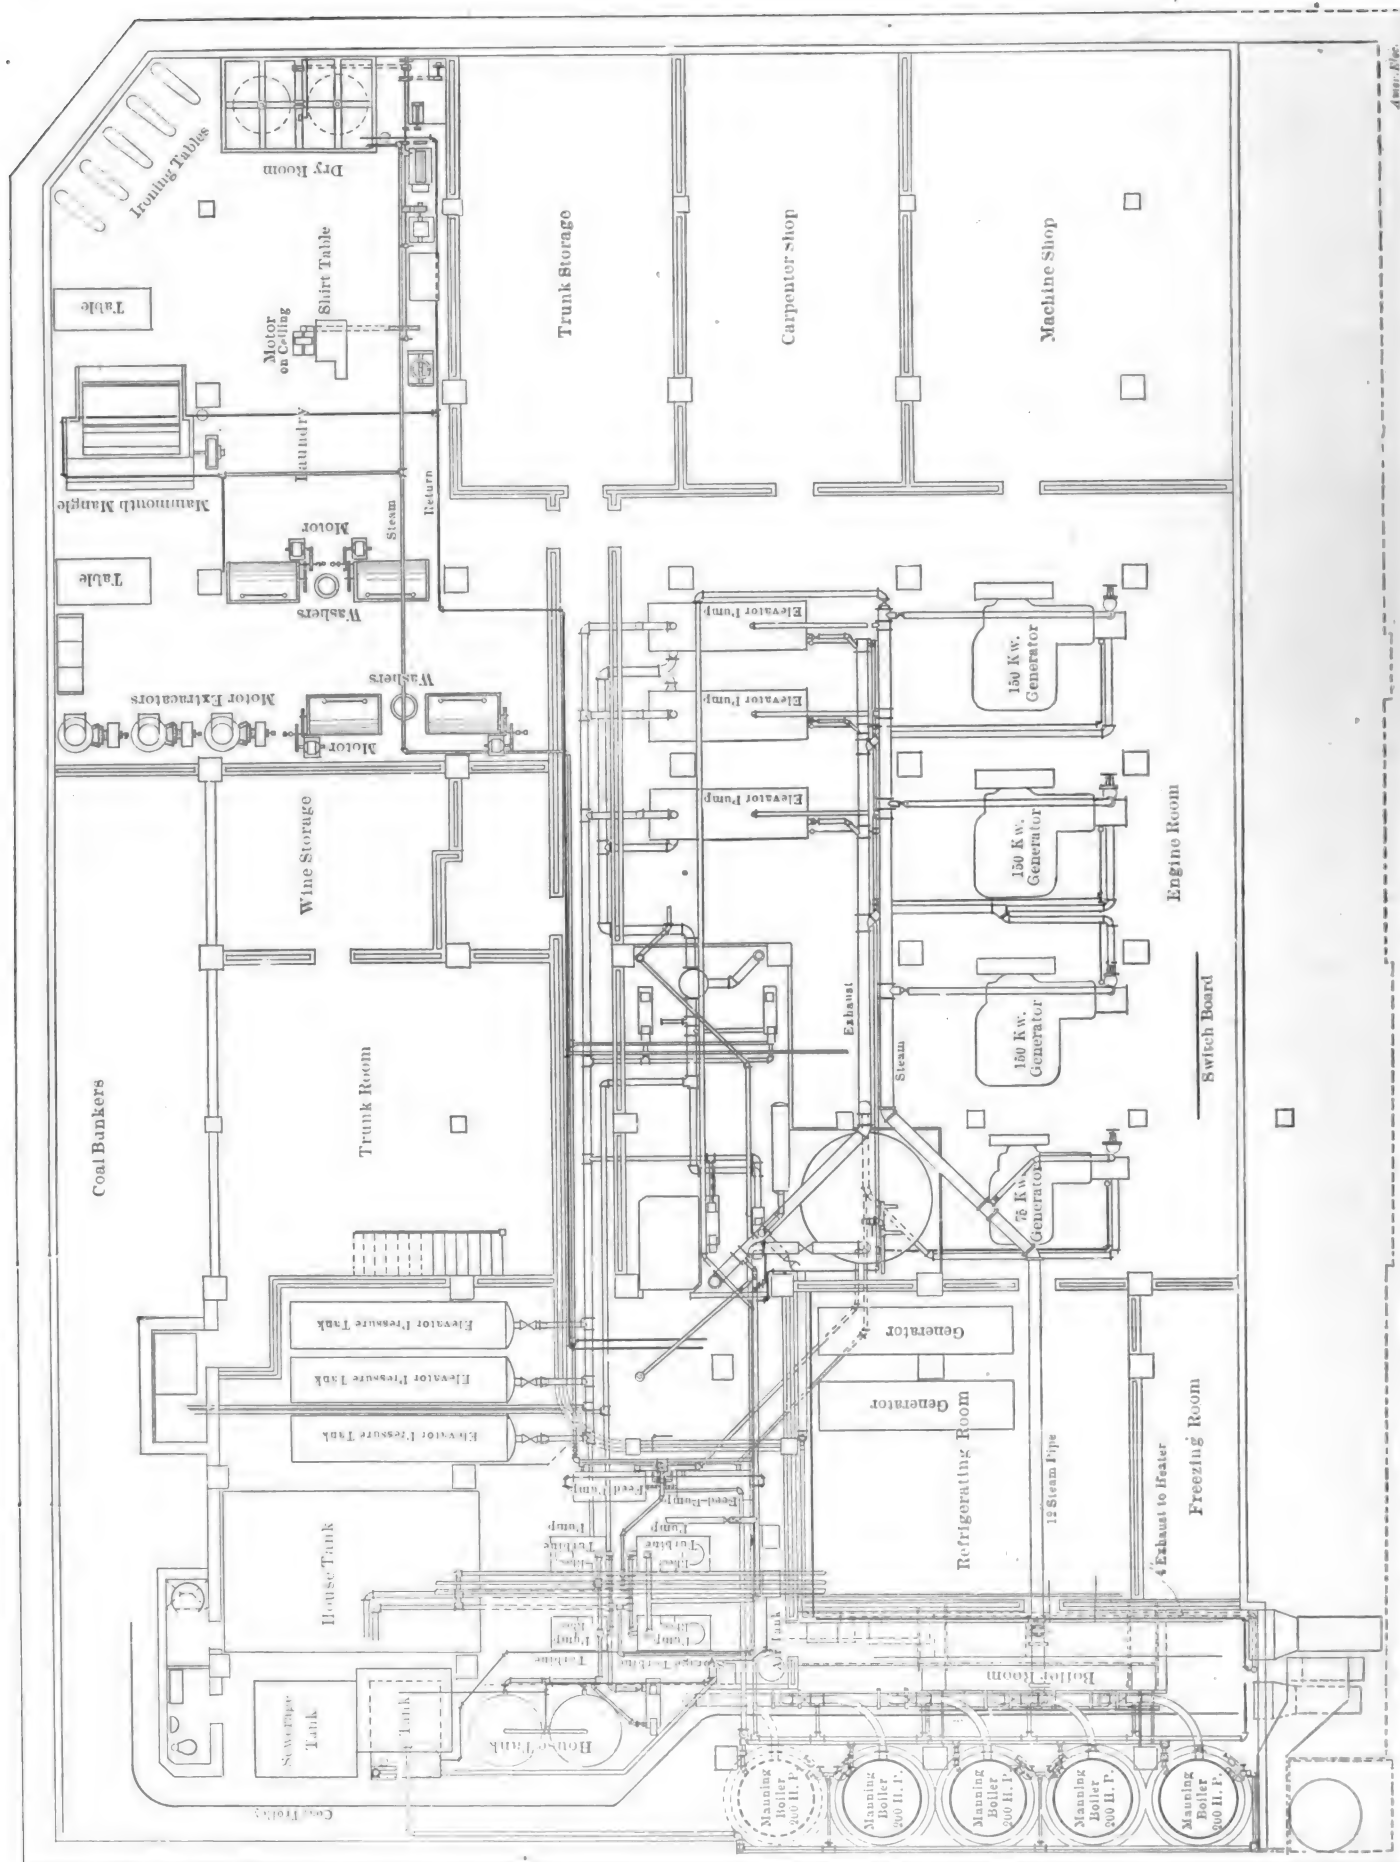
PLAN VIEW OF BASEMENT OF THE HOTEL GOTHAM, SHOWING THE MECHANICAL LAYOUT.
